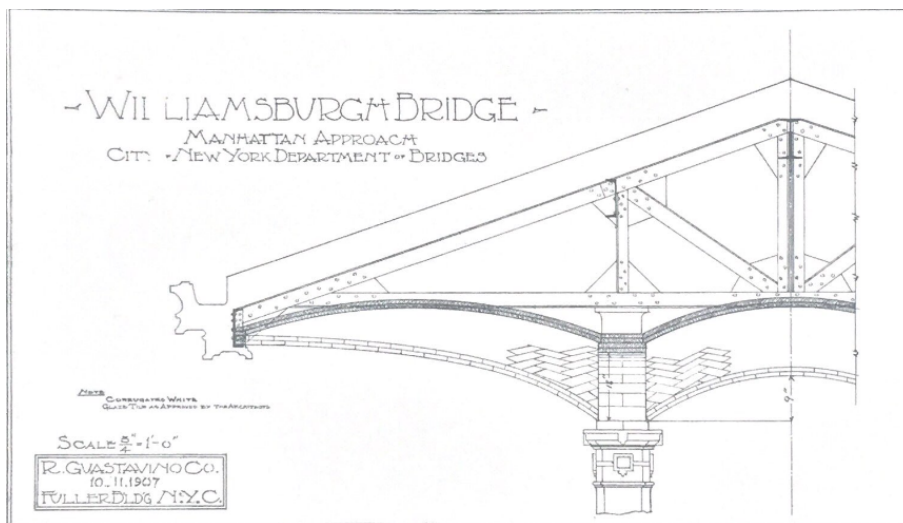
Sectional drawing of Williamsburg bridge approach showing steel trusses supporting a tile vault
